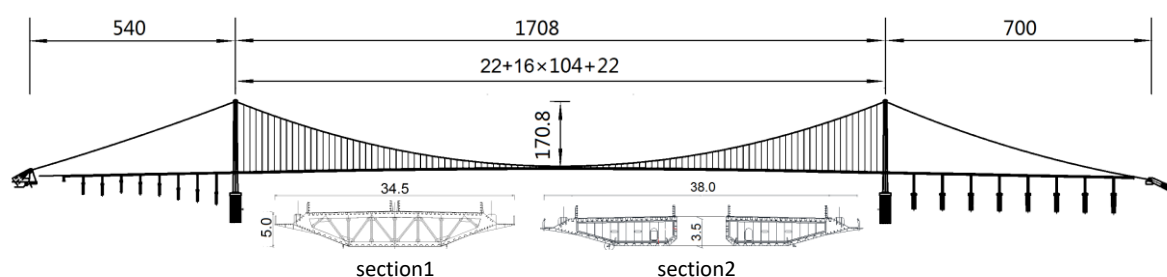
General layout and alternative box girders of Shuangyumen Bridge
